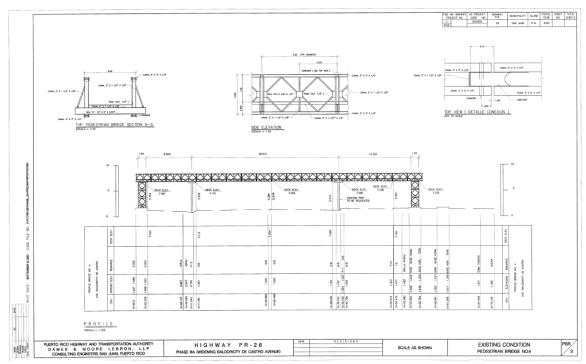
Bridge Drawings 2001 – Sheet 3
